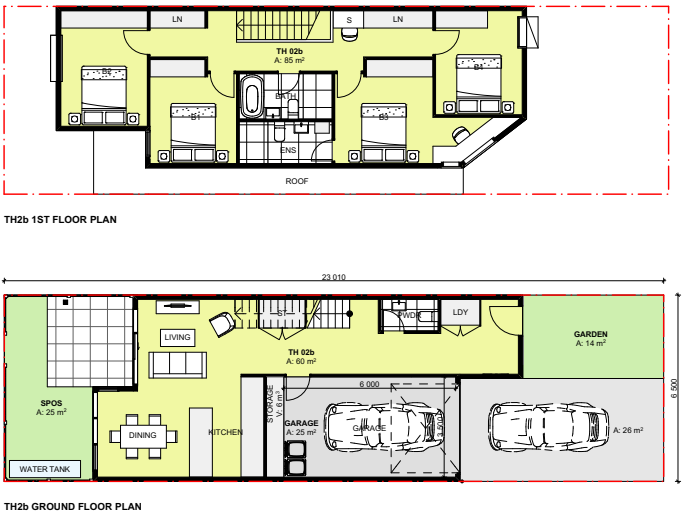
Townhouse Type 02b (Source: Plus Architecture)
